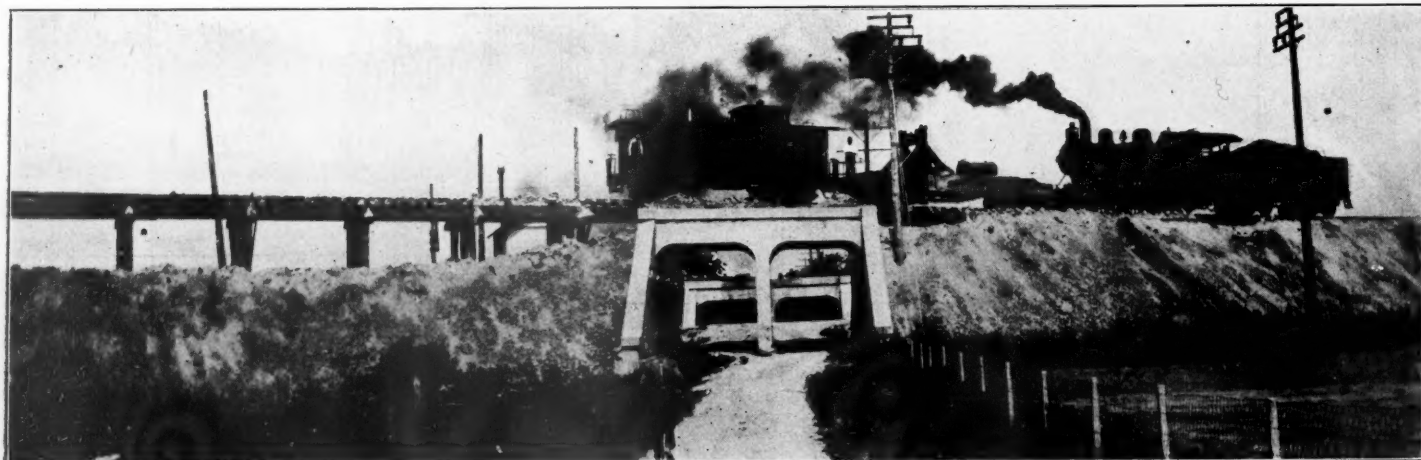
Double Box Center Subway for Highway on Traction Line Change; Vandalia Track Elevation.
